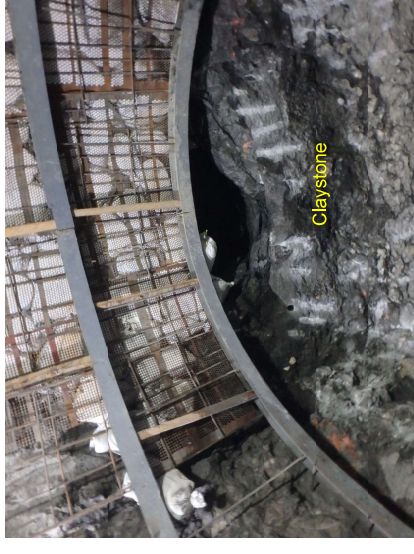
Collapsed portion at the ceiling of the diversion tunnel.
